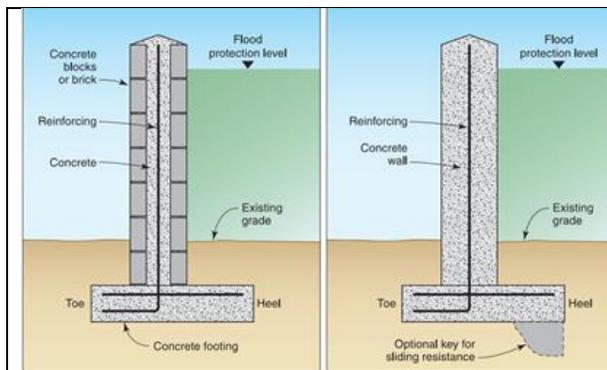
Concrete cantilever floodwall reinforcement (Source: FEMA P-936)
